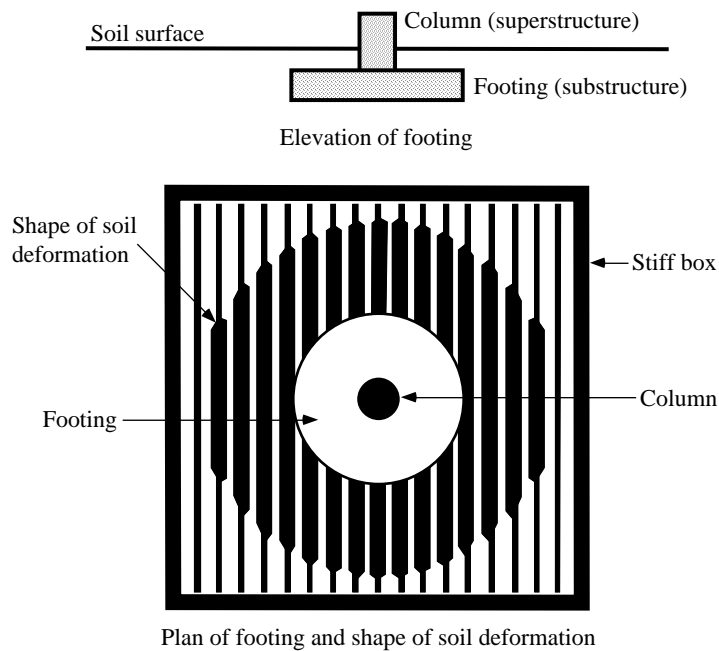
Elevation and Plan of footing in Project GeoChallenge.
